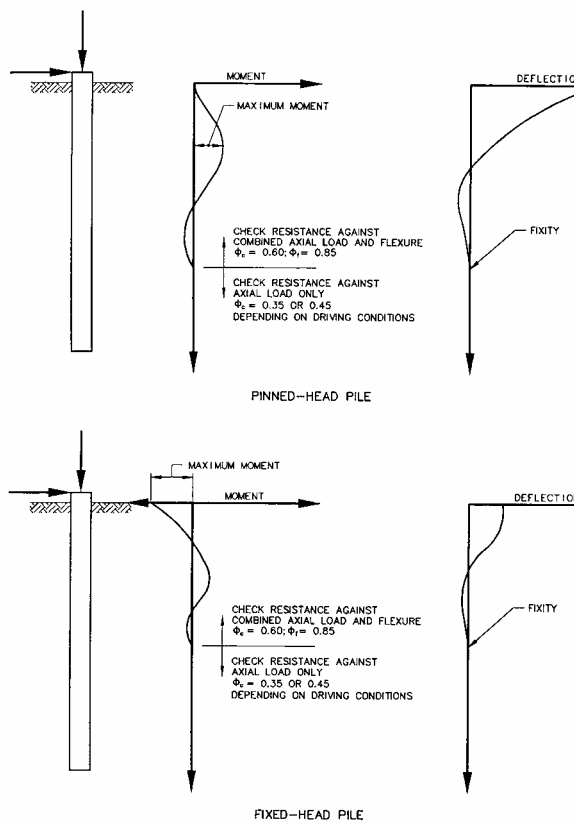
Distribution of Moment and Deflection in Vertical Piles Subjected to Lateral Load
